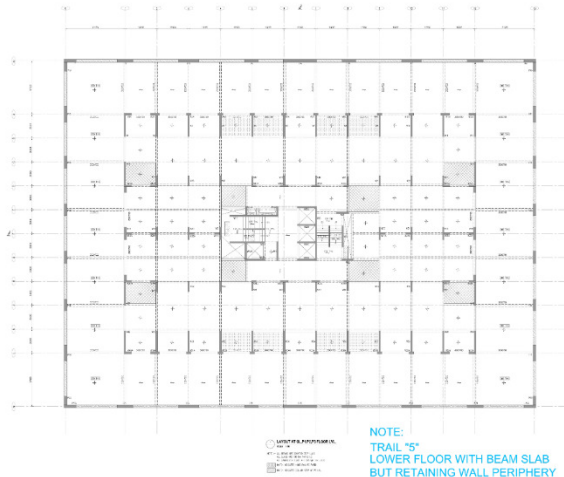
Lower floor with beam slab but retaining wall periphery (Trail:05)
